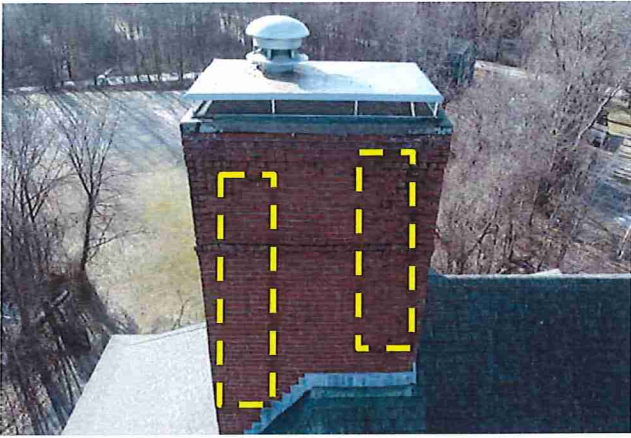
Drone image shows deteriorated mortar joints and step cracking (dashed outline) on the north side of the chimney. Vegetative growth within the mortar joints indicates the masonry is not drying sufficiently on this elevation.
